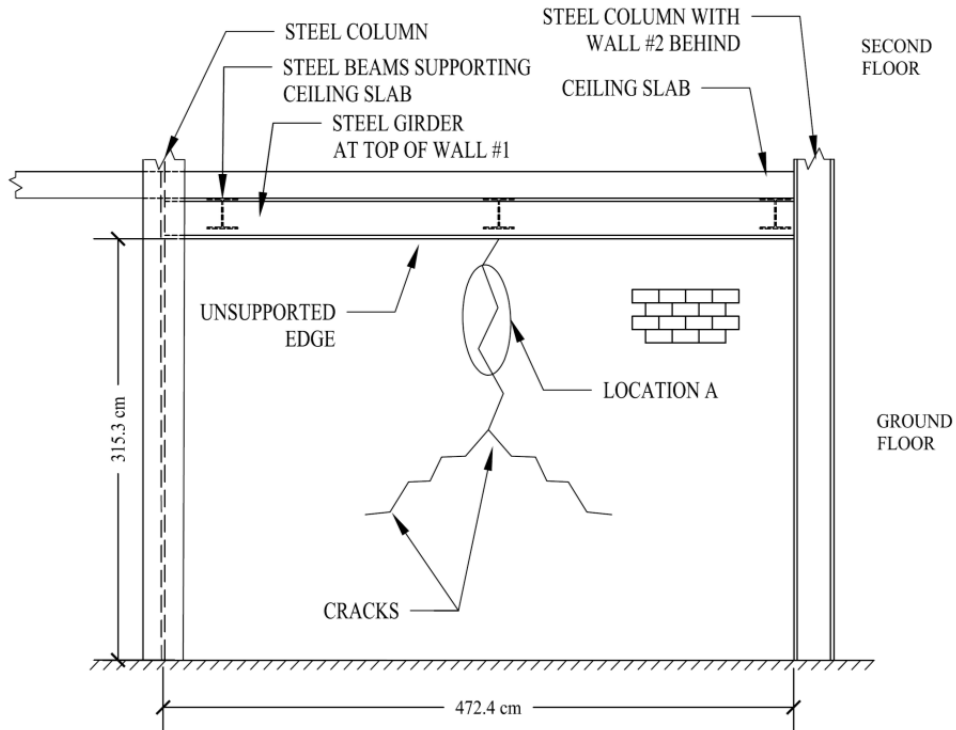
Post-test crack pattern of ground floor infill wall (Wall #1), outside blast chamber looking in.
